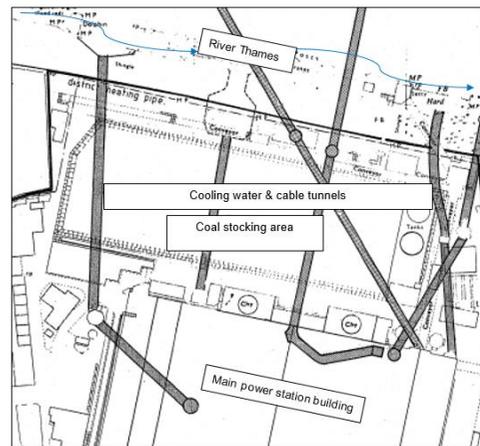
Former Power Station cable & cooling water tunnels adjacent to River Thames
